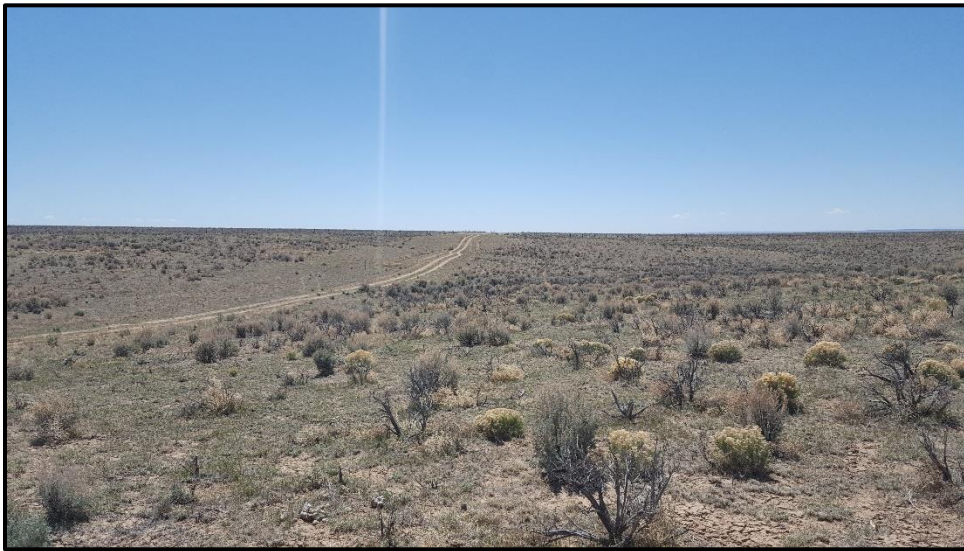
BTWU E35: View from proposed intersection to BTWU A35, facing southeast at the proposed access road and pipeline corridors that connect to the Lybrook Resource Road.
